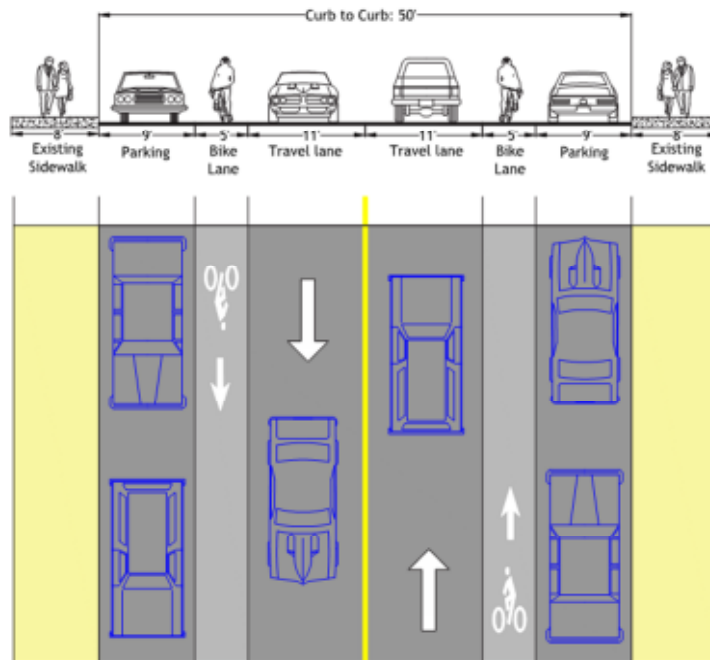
MAPLEWOOD AVENUE EXISTING CONDITIONS AND CROSS SECTION
